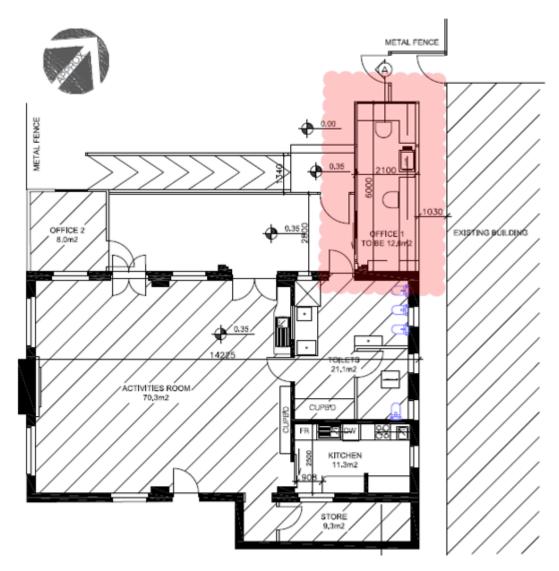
Floor Plan, administration office to be extended highlighted in red.
